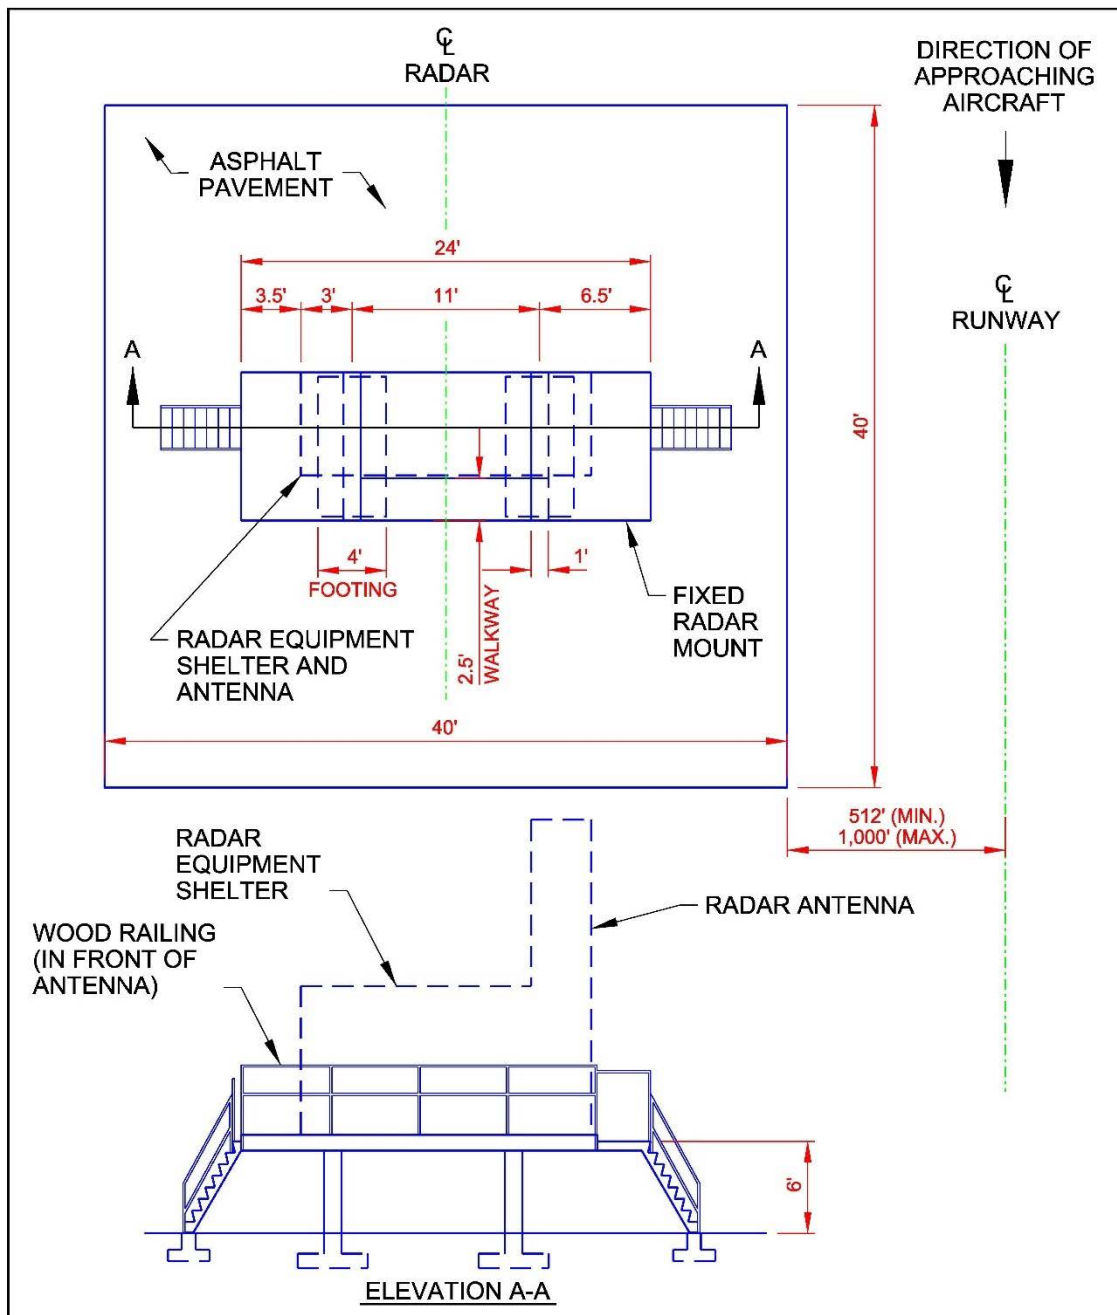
PAR Facility: Fixed Mounted Radar Plan and Elevation
